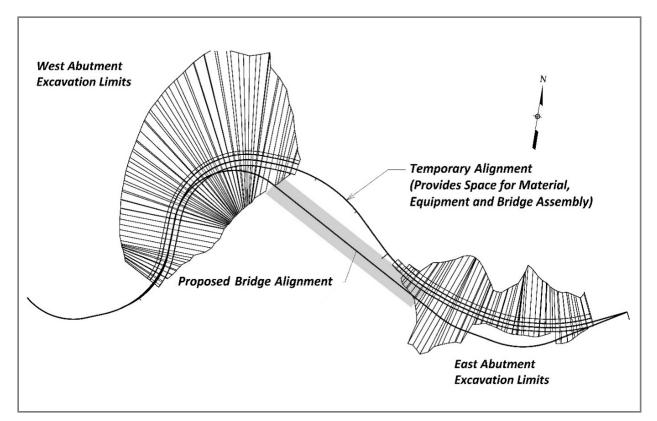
Excavation limits. East abutment excavation provides space for bridge assembly during construction and a rock fall ditch post construction. The west abutment excavation provides for the bridge approach road alignment (turning radius).
